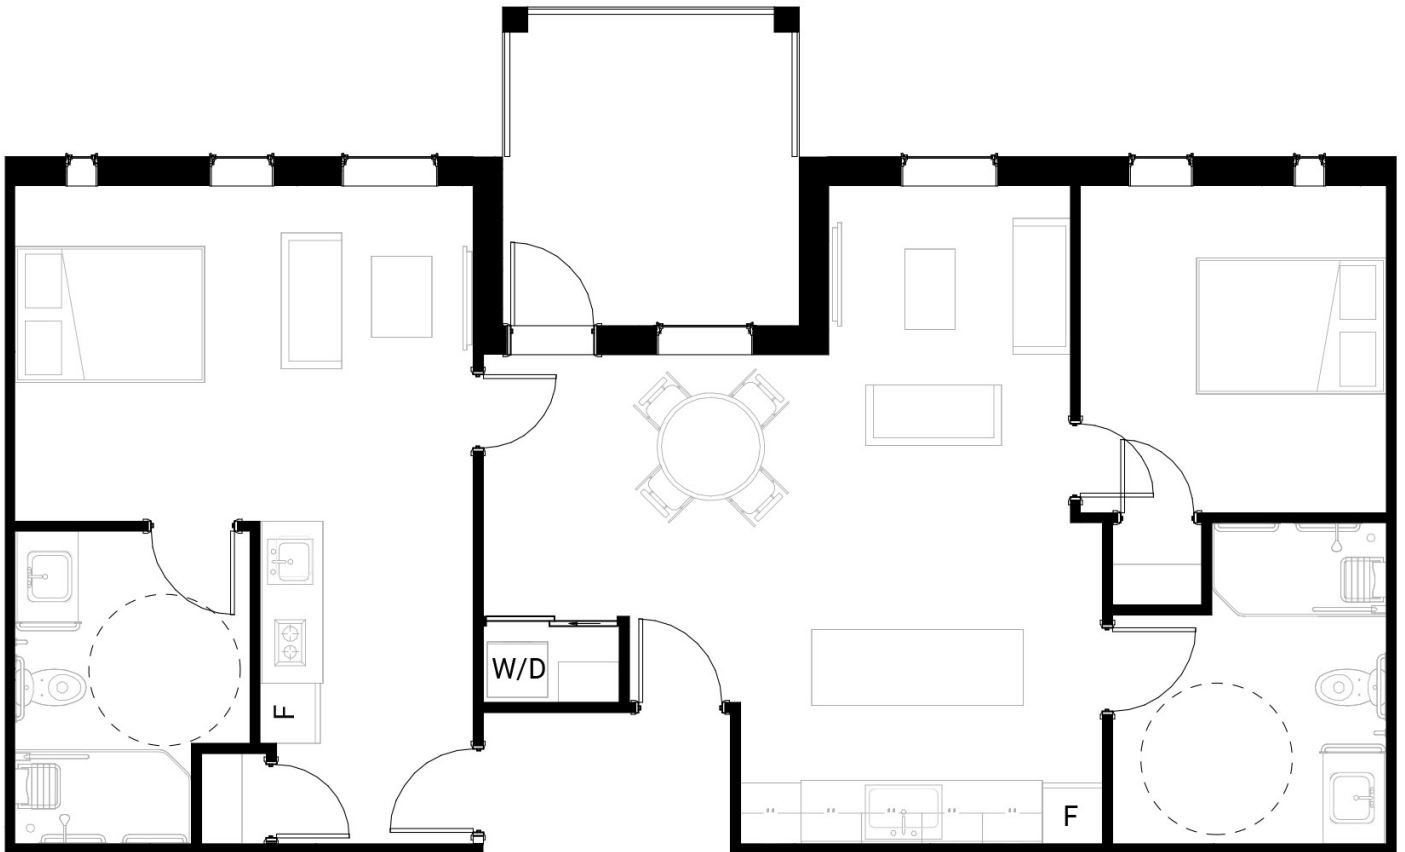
Unit Type 6 Floor Plan | Scale: 1:75.
